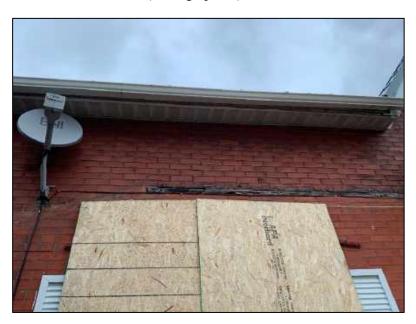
Dropped brick above southernmost second-floor window (west elevation).
